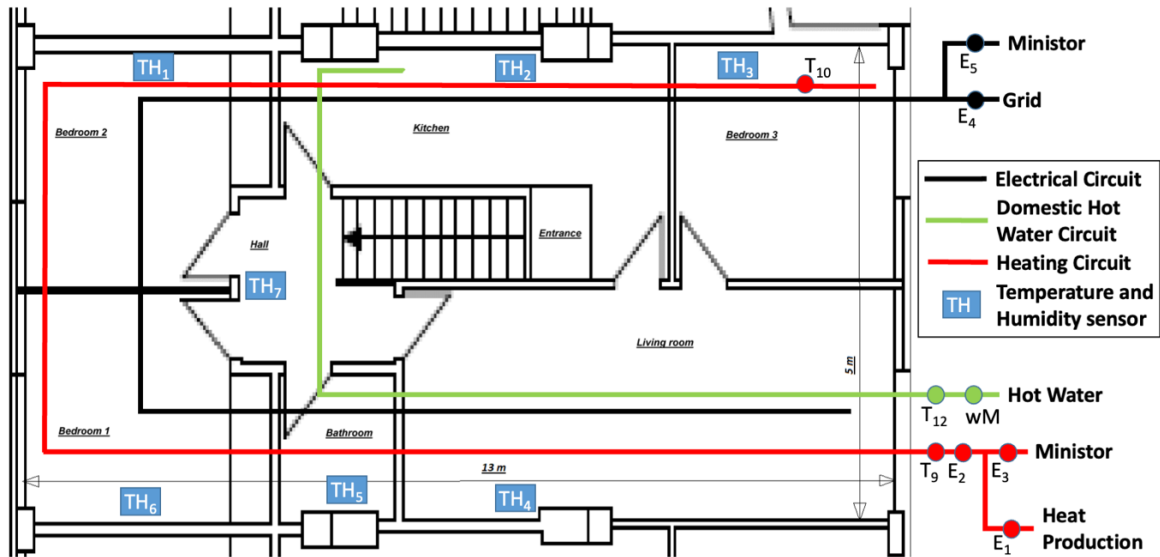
Floor plan of the apartment and its connection to the hydraulic system.
